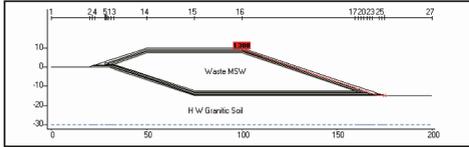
Typical failure section within landfill cover for Case 6 to 9.
